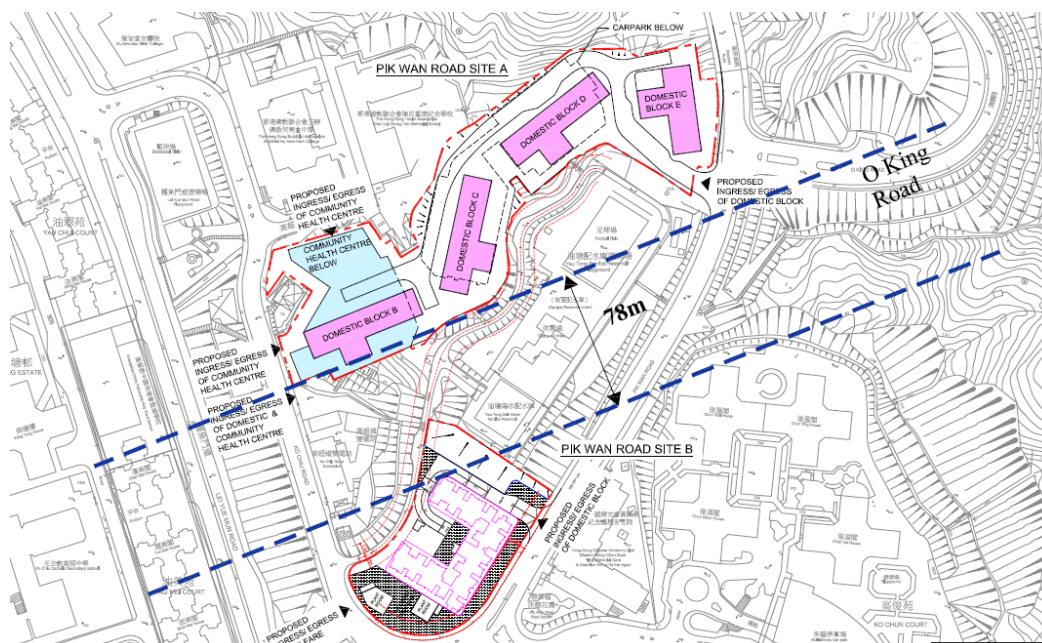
Air Path between the Baseline Development and Pik Wan Road Site A
